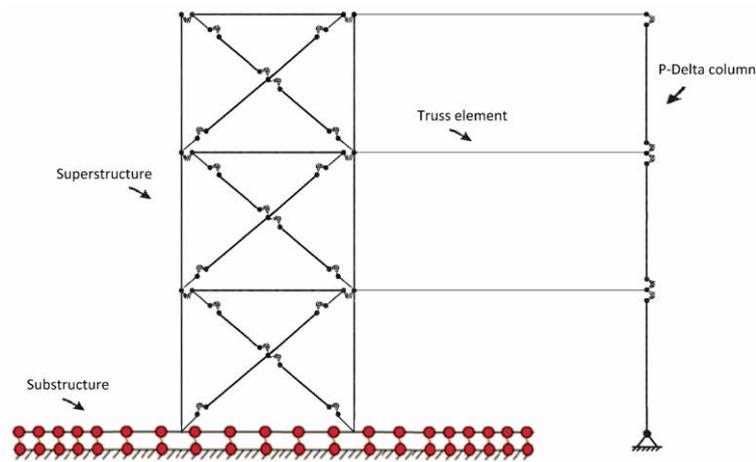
OpenSEES model of structure-foundation-soil system (adapted from Aguero (2006) and Prishati (2008))
